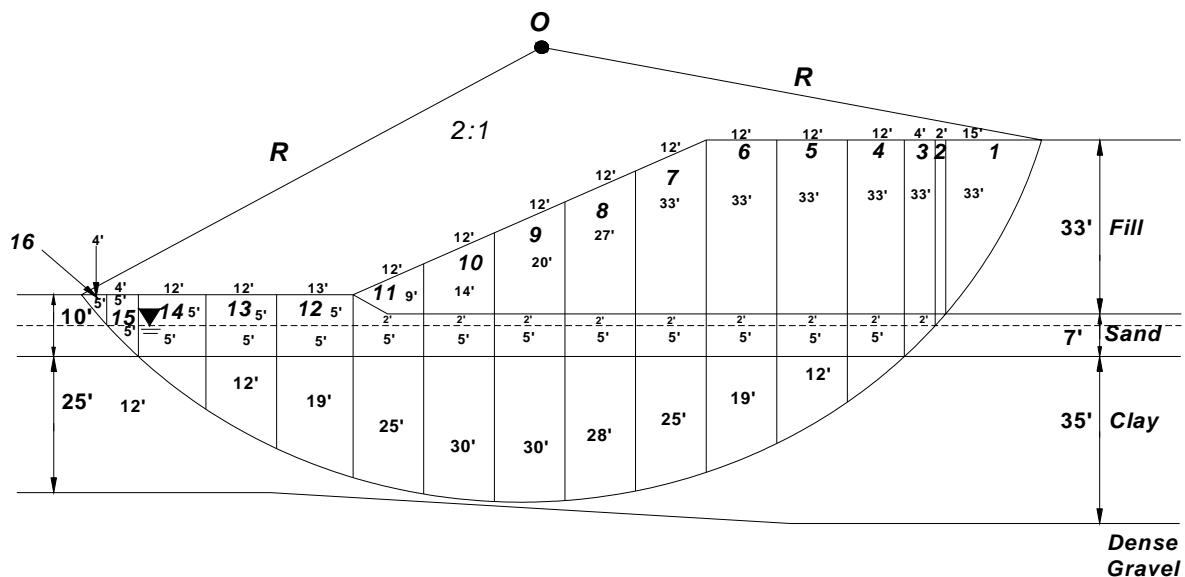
Vertical slices above assumed failure arc – East Abutment.
